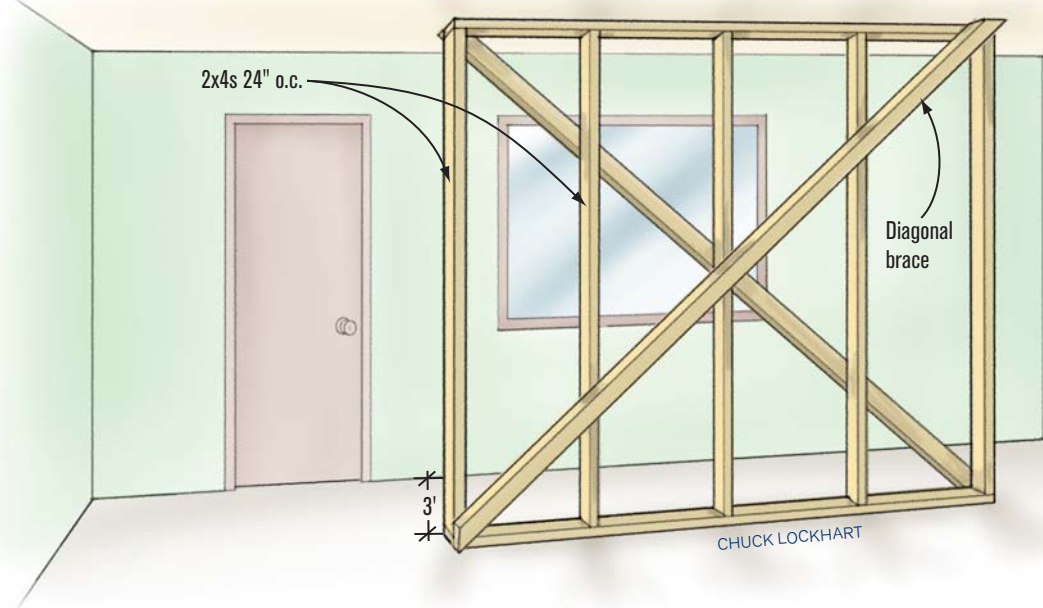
Before any structural work is done, the author wedges in a temporary wall built from 2x4s. Placed about 3 feet from the outside wall to provide working room, the temporary wall supports the load from above. Carpet scraps pad the wall's top and bottom to minimize damage to the flooring and drywall. The temporary wall can be wrapped in plastic sheeting to help contain the dust.
